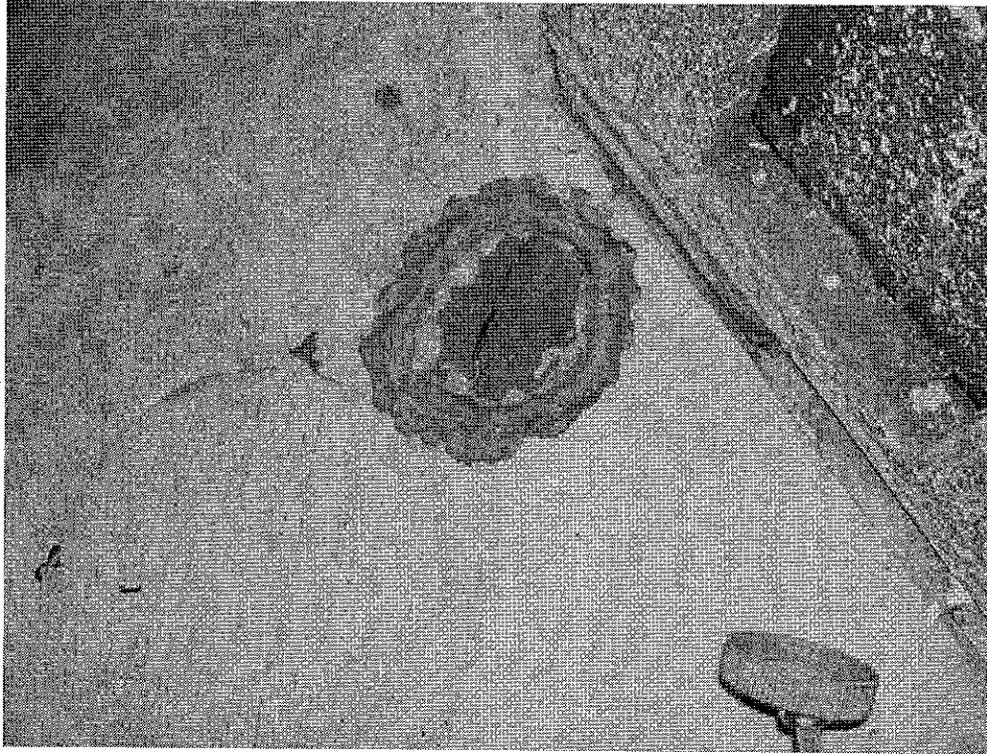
View of pour test in clay basin, just southwest of sink/drain area (boring B-C on lower left side of photo). Open crack, where water fell through crack, is visible in lower portion of basin.
